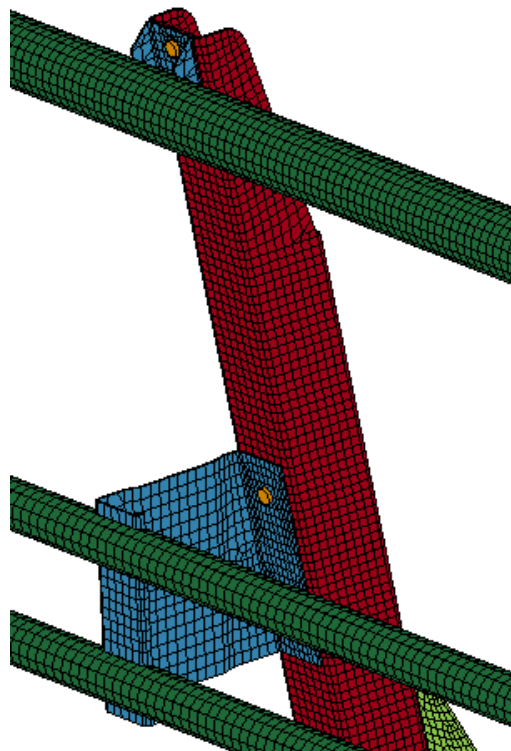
Detailed view of some barrier elements: post, triangular reinforcements, spacers, tubes, bolting.
